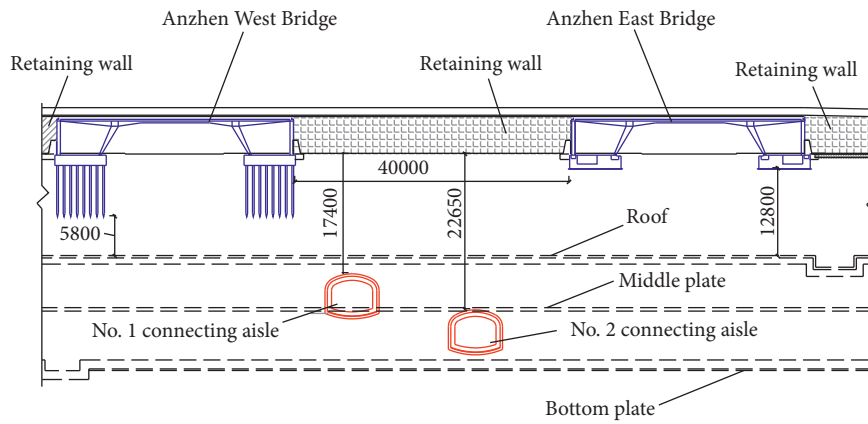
Vertical positions of the connecting aisles and the retaining wall (unit: mm).
